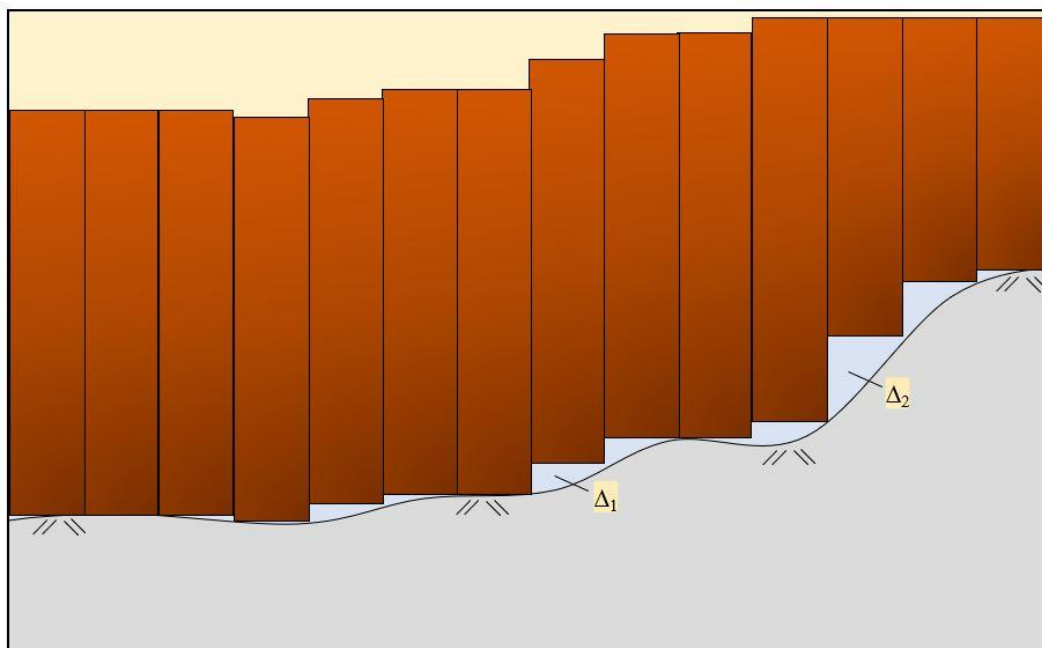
Illustration of the triangular gaps formed when driving sheet piles to a sloping bedrock.
